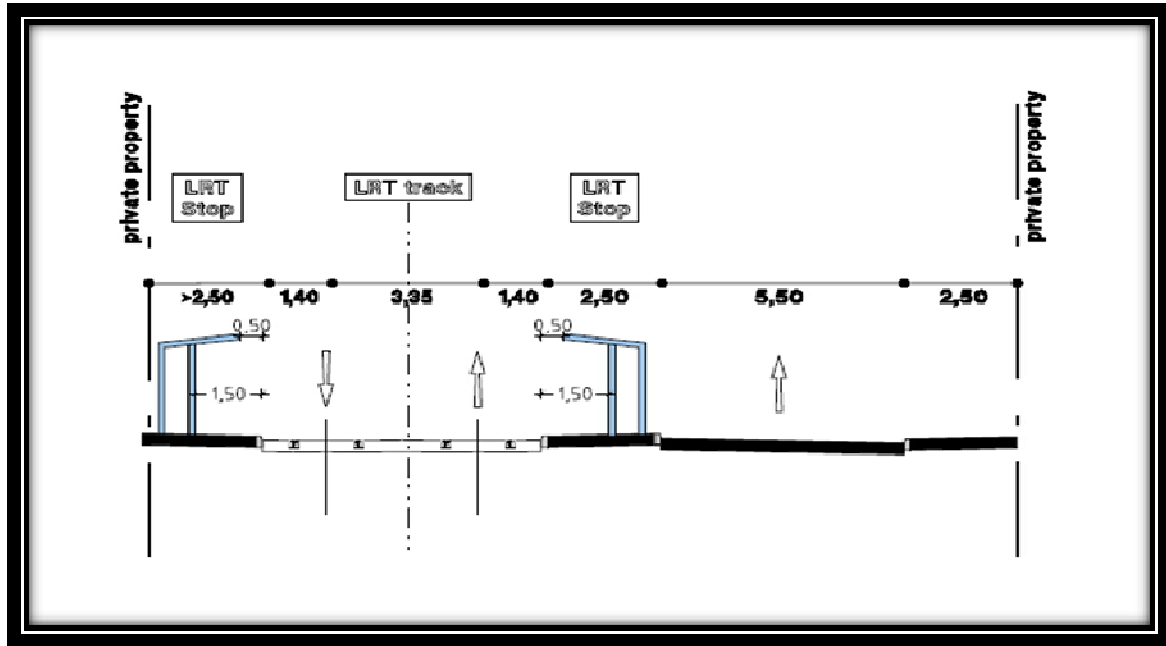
MckNimir Tunnel (Cross Section at road)
